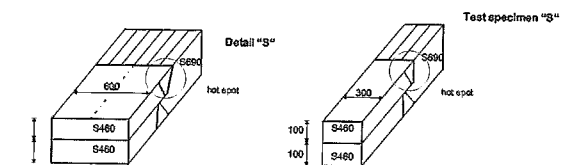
Test specimens for the verification to avoid brittle fracture
